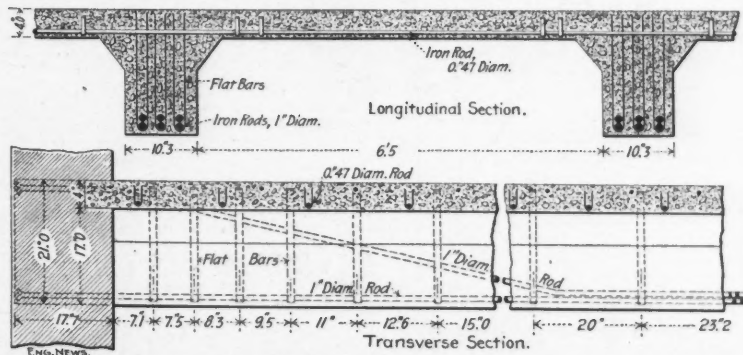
HENNEBICQUE BEAM SYSTEM OF STEEL AND CONCRETE FLOOR CONSTRUCTION FOR THE PETIT PALAIS DES BEAUX-ARTS FOR THE PARIS EXPOSITION OF 1900.
